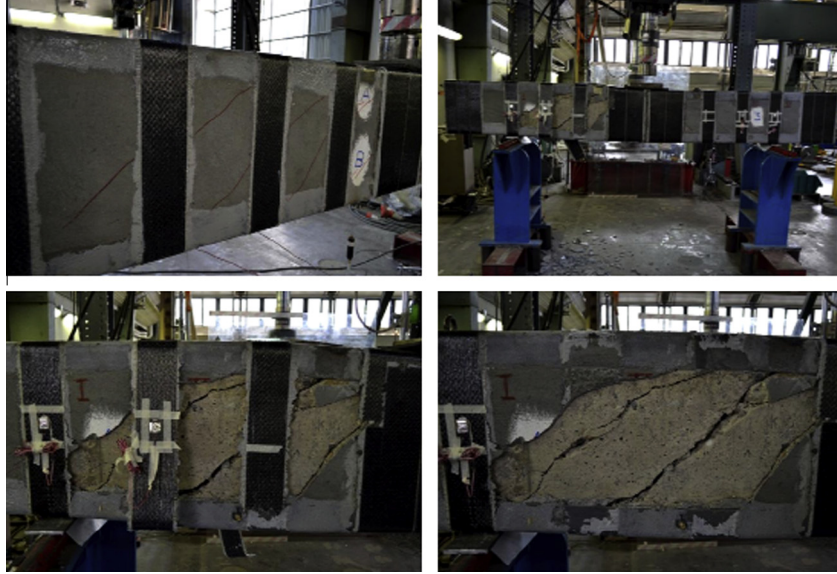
Element CW90-8.6/30D after collapse: crack path.
